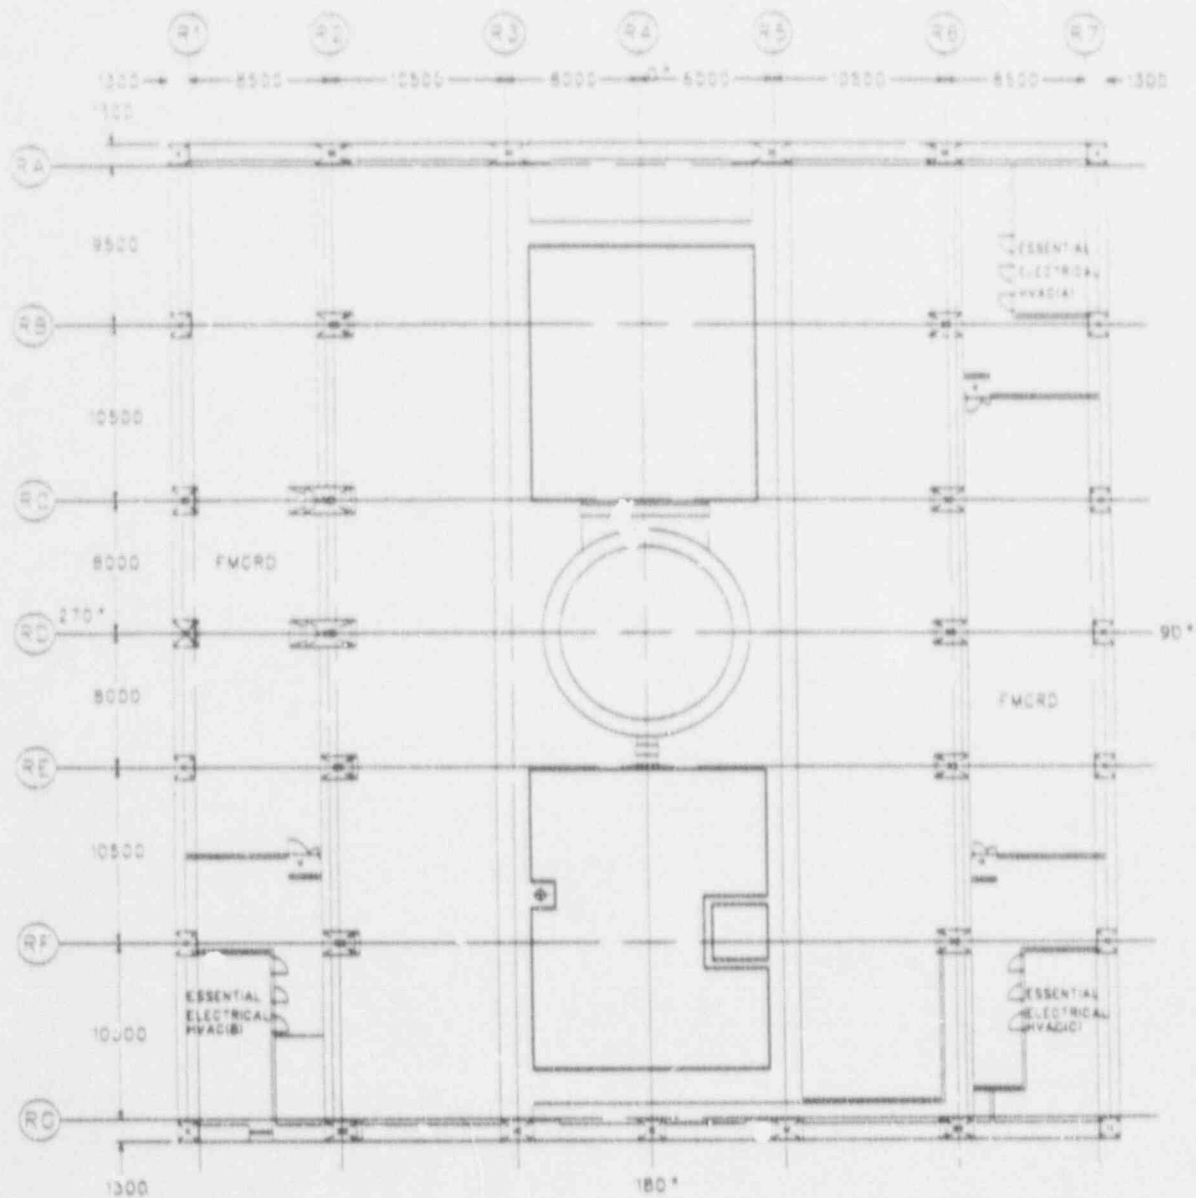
Reactor Building Arrangement—Elevation 20800 and 21200 mm
